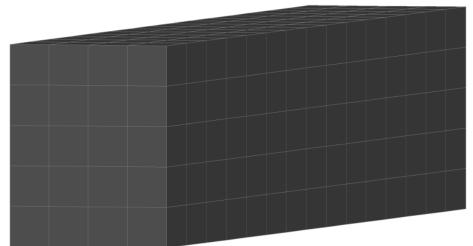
Example of a 3D model for a gabions wall built in AutoCAD.
